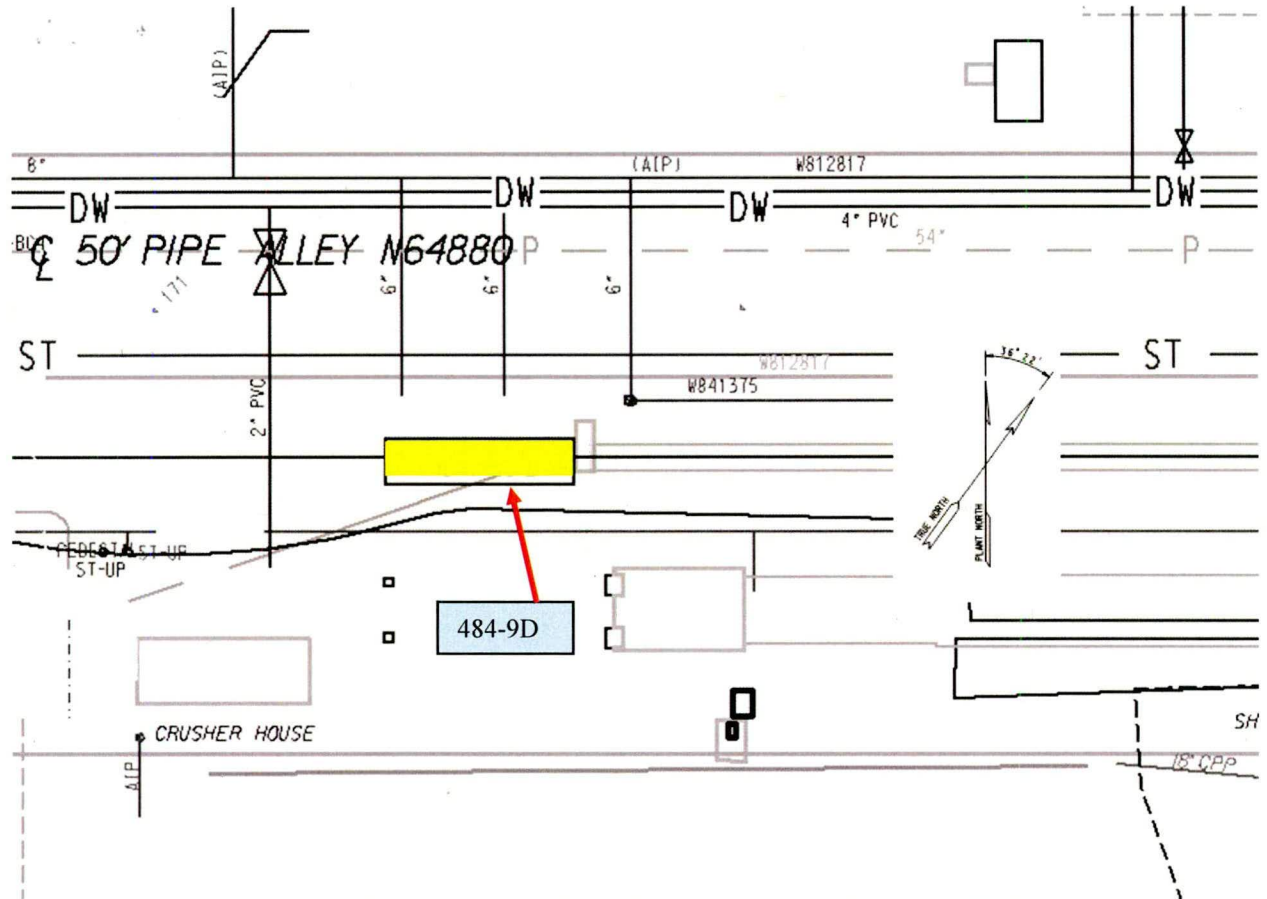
Building 484-9D and Surrounding Facilities/Utilities
